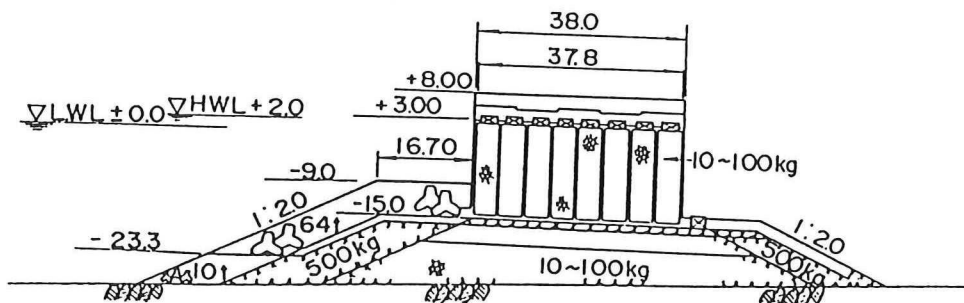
Cross-section of the widest caisson breakwater at Hedono Port
